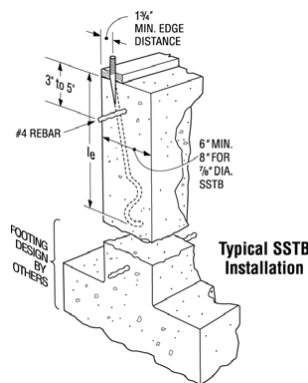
TYPICAL SSTB ANCHOR BOLT INSTALLATION (No. 4 Rebar in Breakout Zone, Min. 1³/₄\"/>
